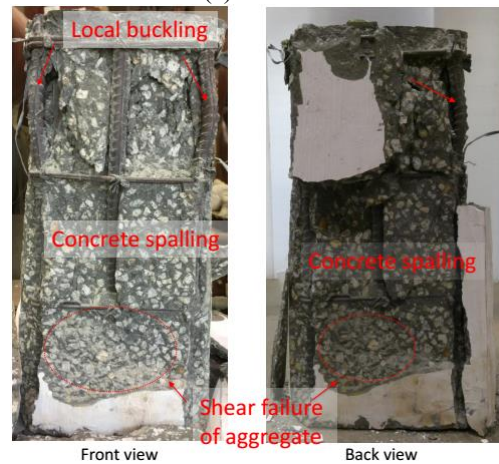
depicts the failure condition of the specimens at the end of the test. It was found that the basic failure mode of VHSC encased steel composite column under compression with/without eccentricity was concrete spalling followed by local buckling of rebar, since the spalling concrete lose the bond resistance to the
